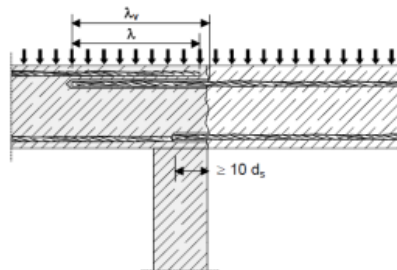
Overlap joint for rebar connections of slabs and beams
